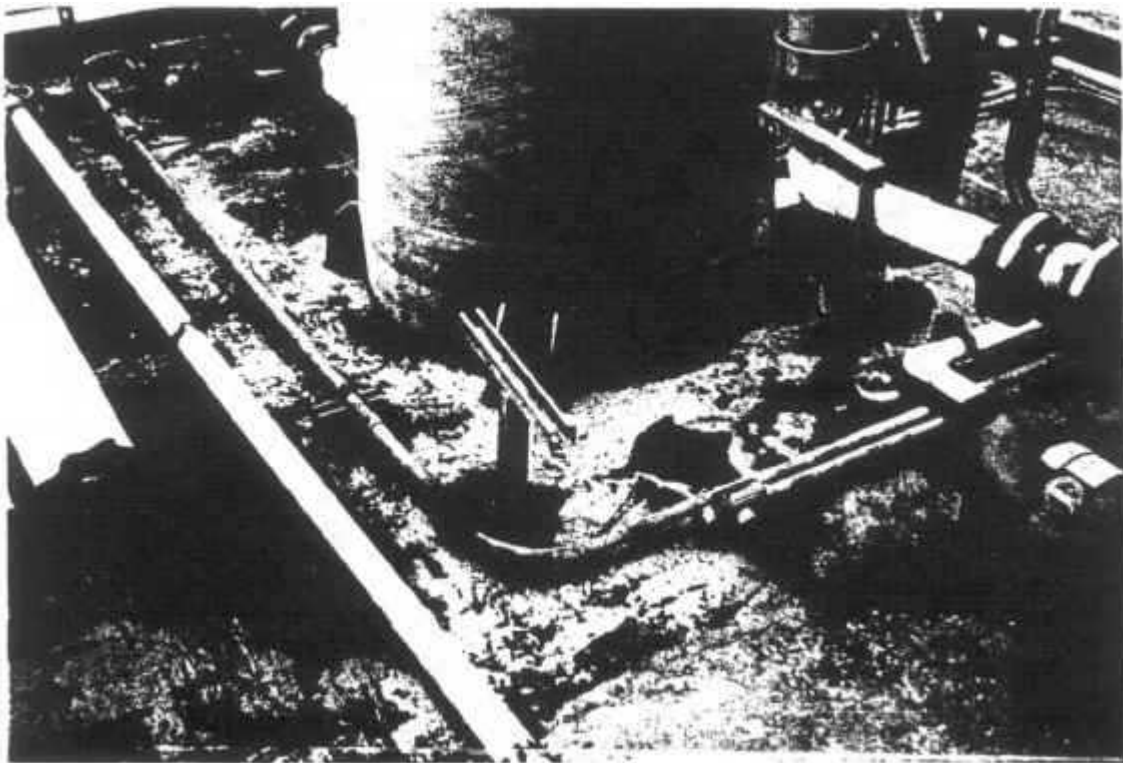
View of Valves, 5 HP pumps, and Air Stripper Tower Base Slab
